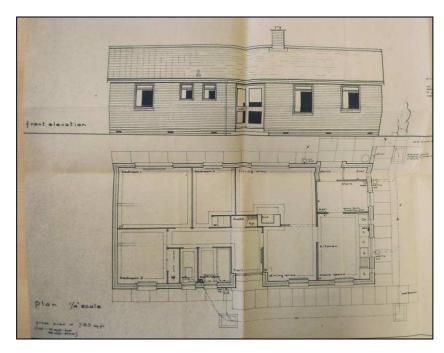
Proposed main elevation and floor plan for new bungalow in the ground of Moor Park 1966
